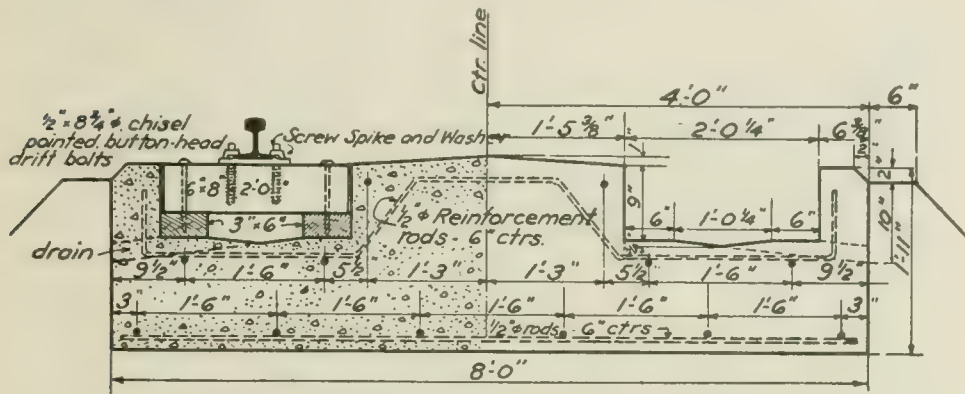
CONCRETE RAILWAY TRACK AT THE CHICAGO JUNCTION R. R.
